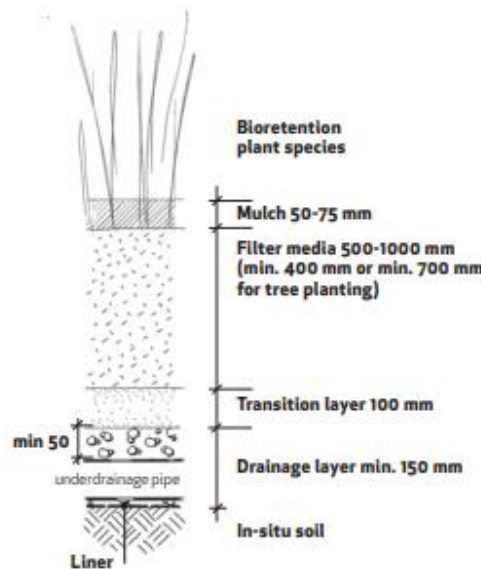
Cross Section of Bio-Retention Basin with a Sealed Drainage Zone
